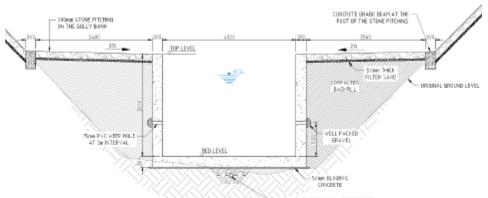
Typical proposed Concrete Cana Section - SMEC, 2016
